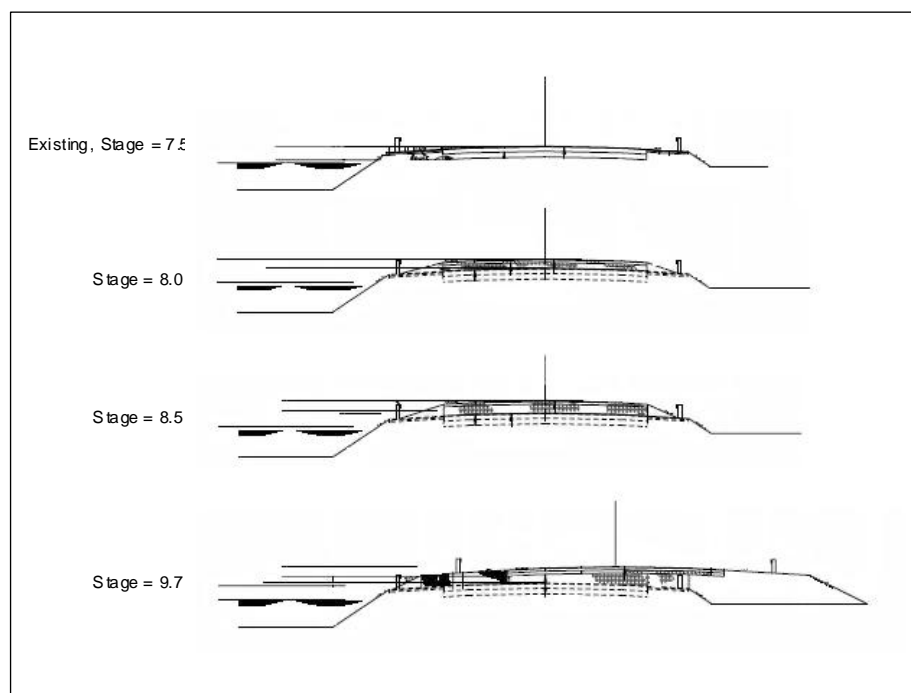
CANAL STAGE INCREMENTS AND ASSOCIATED MODIFICATION TO THE ROAD CROSS SECTIONS
